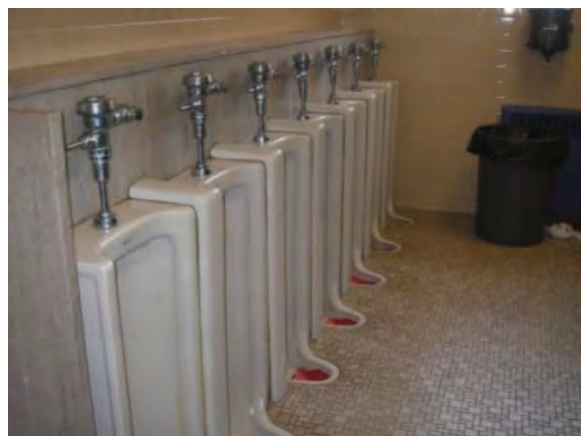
1902 BUILDING BOY'S RESTROOM URINALS
